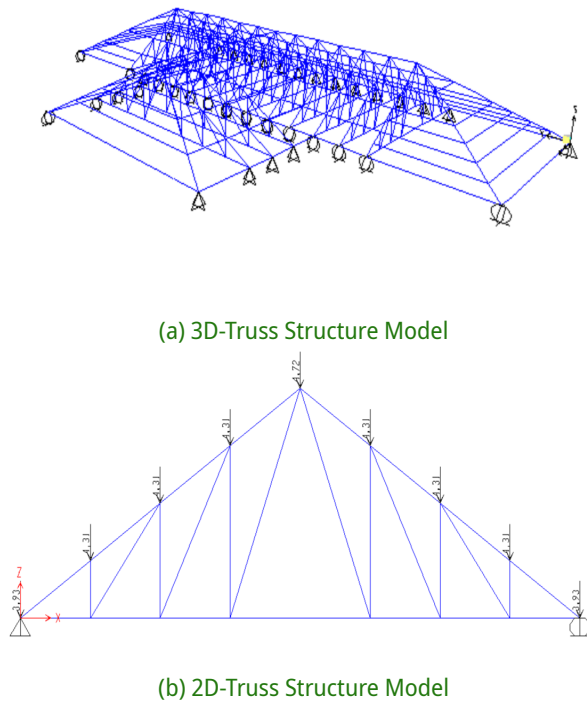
3D-Model Cold-Formed Roof Truss Structure.
